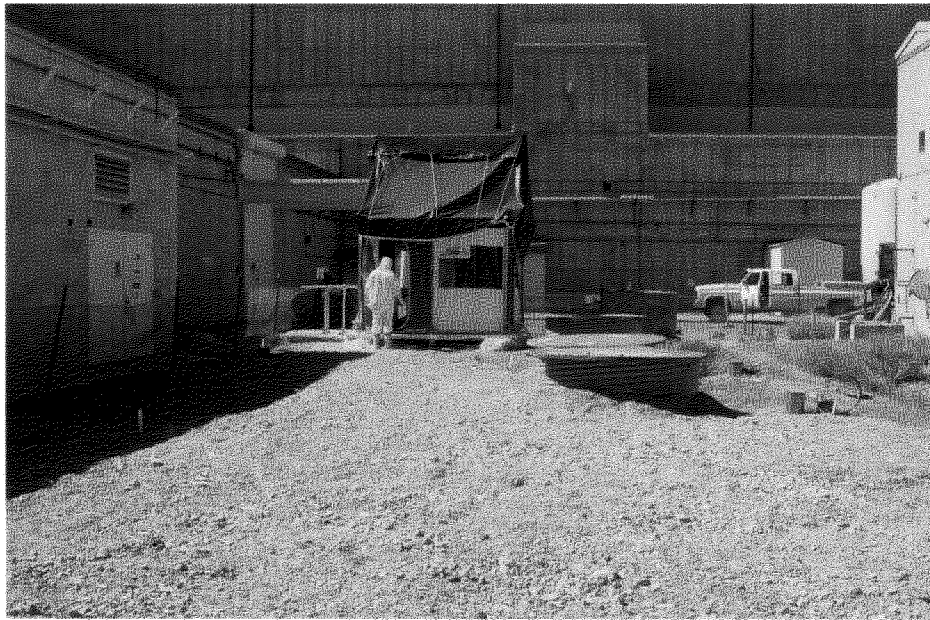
View of V-Tank area at Test Area North during Tank V-9 sampling (looking south).
